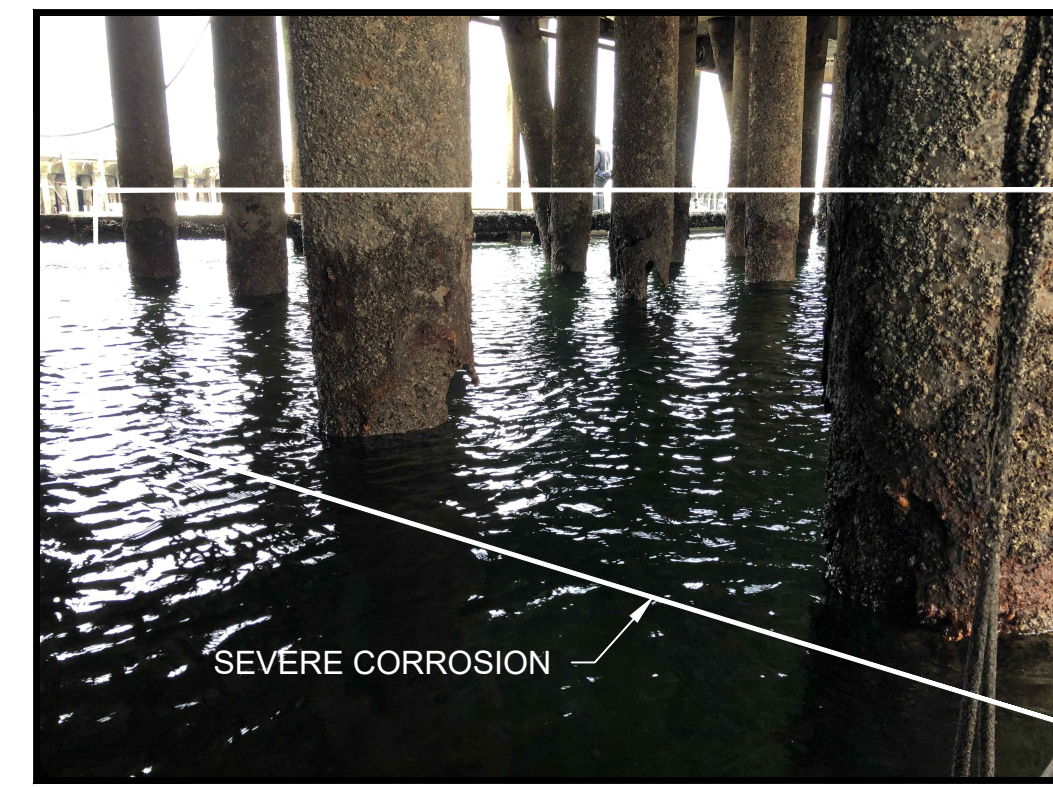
SEVERE CORROSION OF PILES (TYP.)
